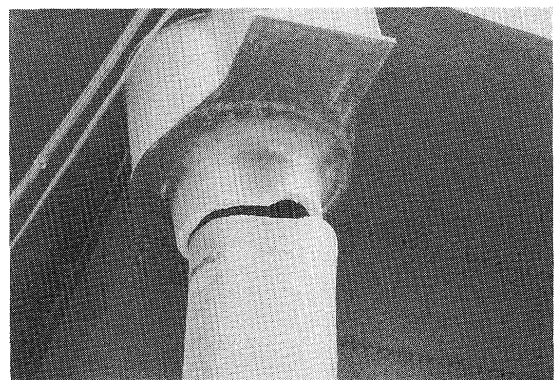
Brittle fracture of circular pier made by centrifugal casting.
